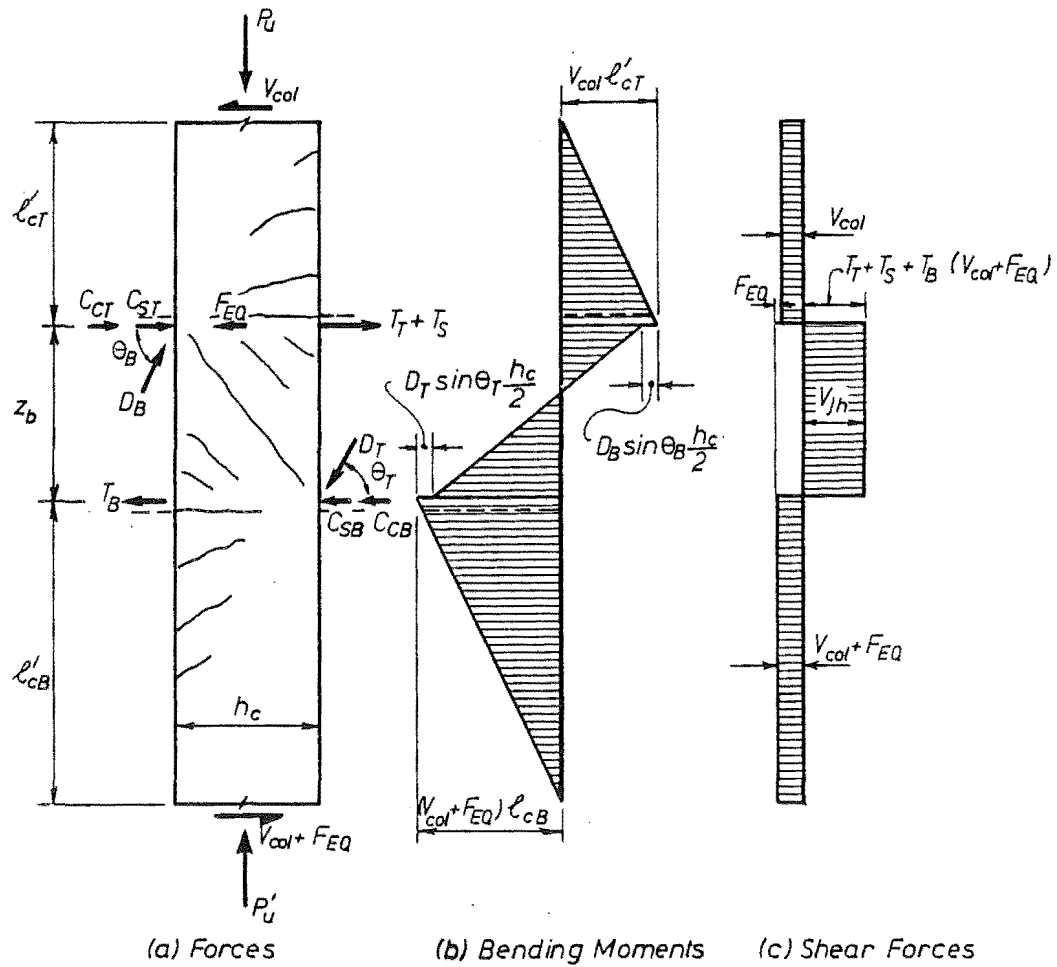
Forces Acting Upon a Concrete Column.
